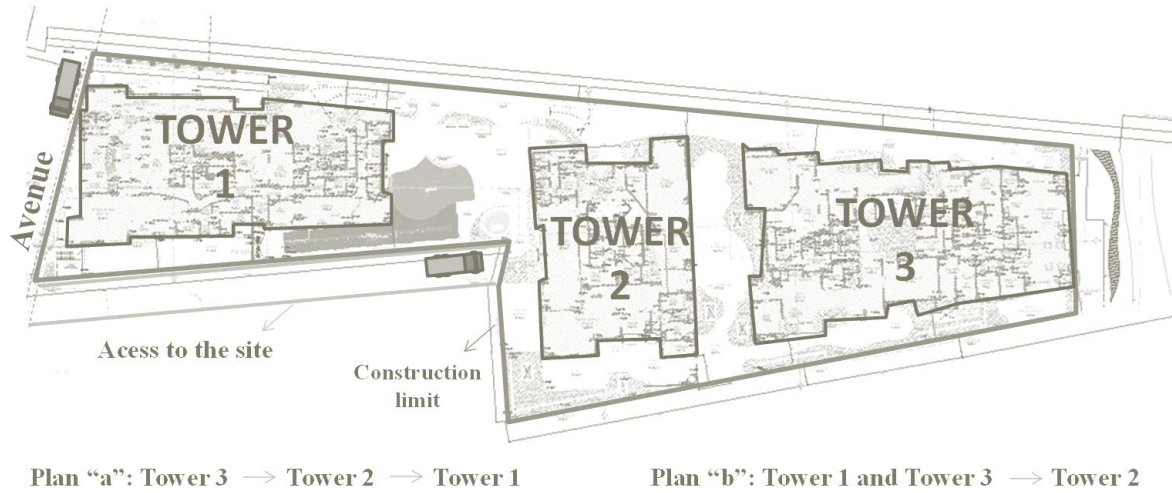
Project with three fifteen-story apartment buildings in Rio de Janeiro state- Brazil
